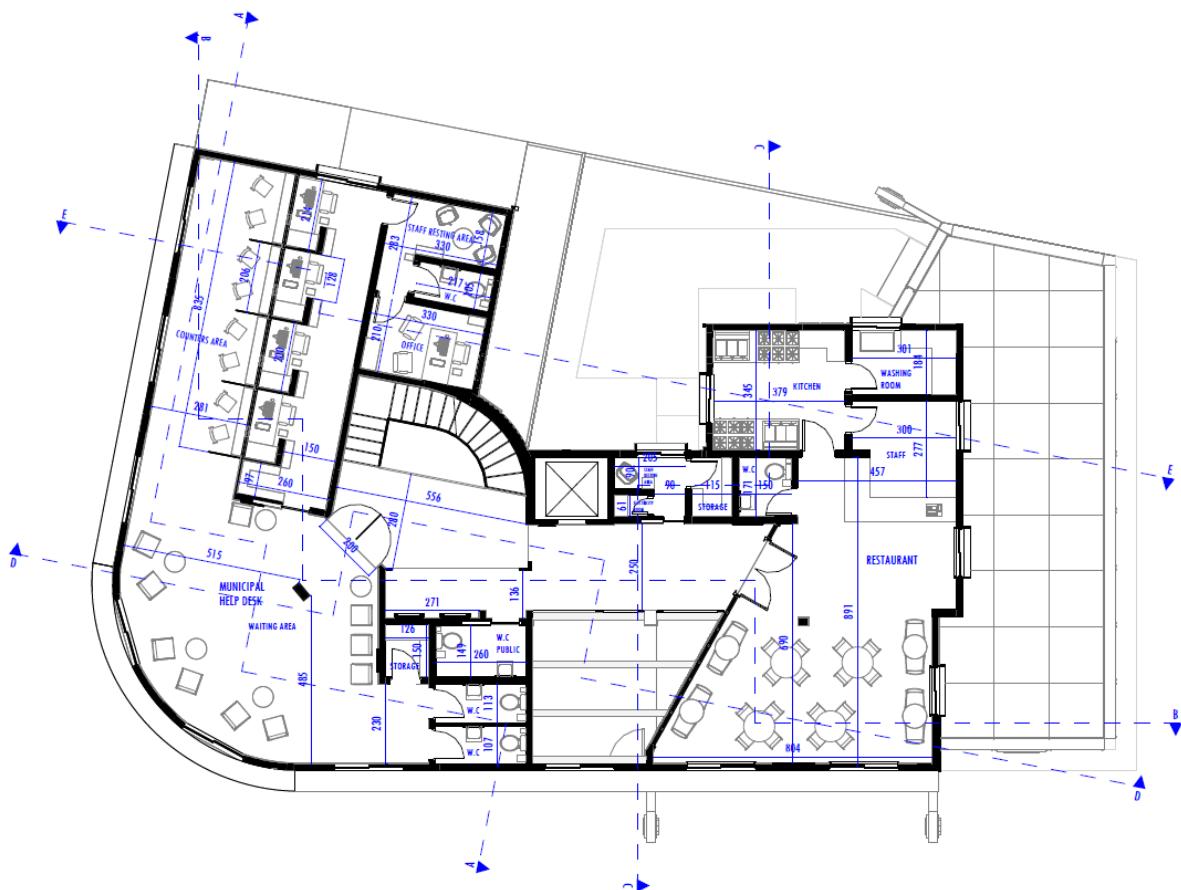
First floor plan of Honigmann House (for scaled version see fig.B.14 in appendix).
